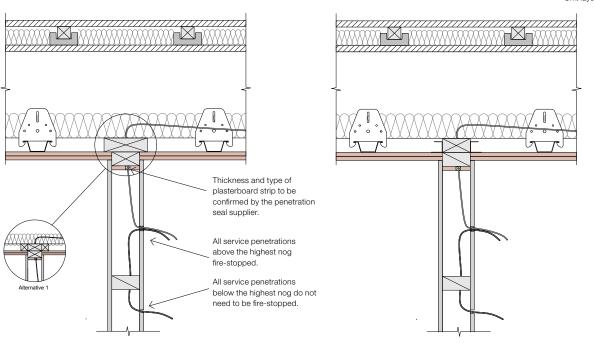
NLB Internal Partition or Bracing Wall penetrating the Ceiling
